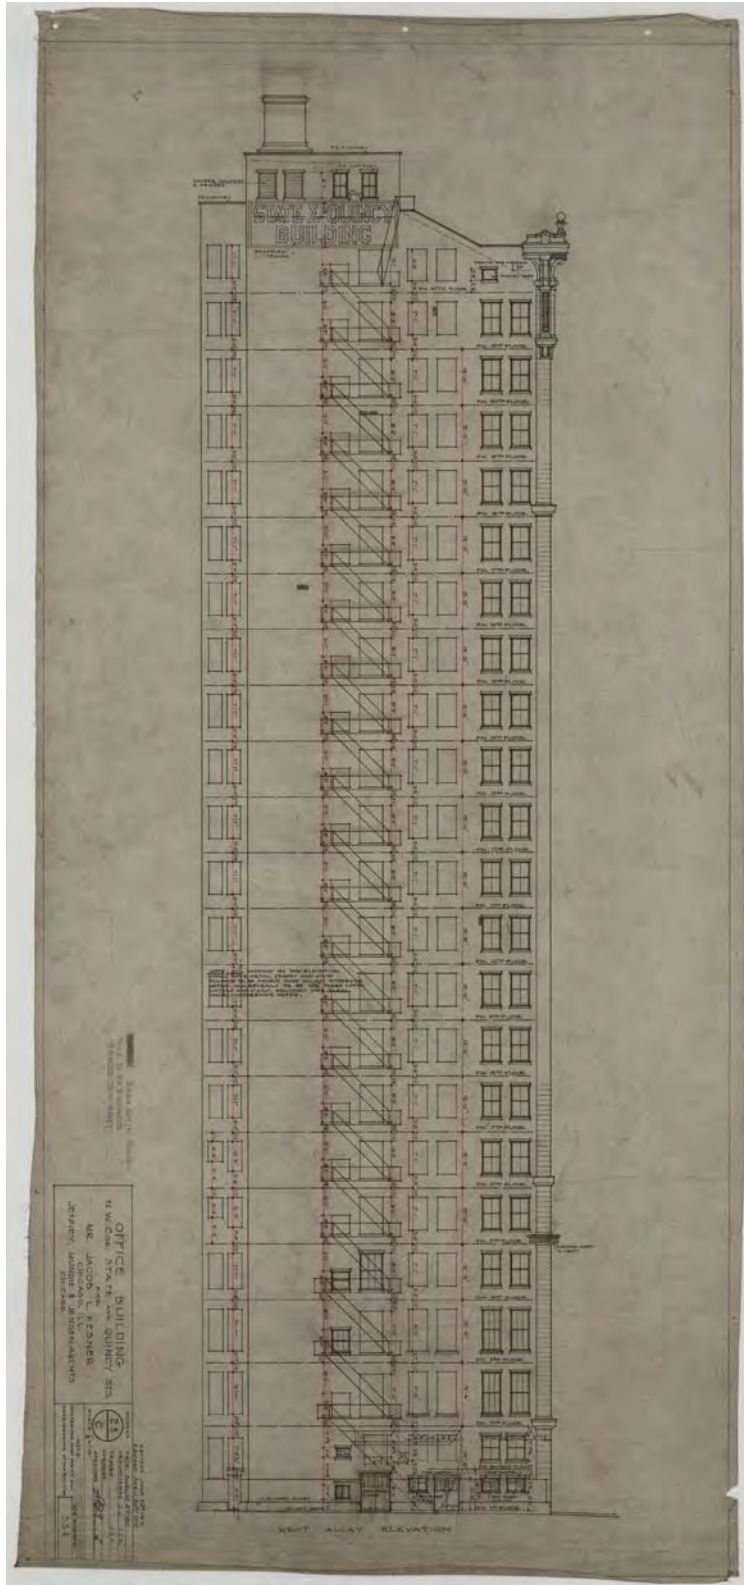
Original drawing of west façade, Jenney, Mundie & Jensen, 1911.
